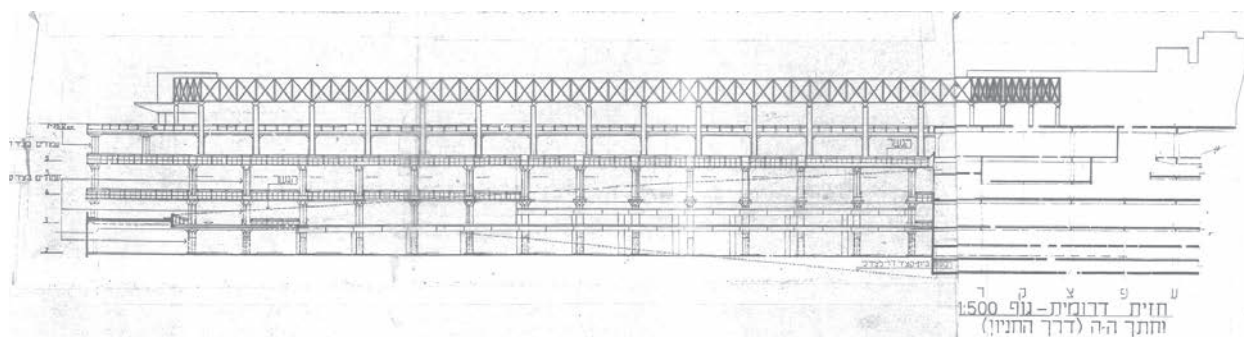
SOUTH HAKONGRES ST ELEVATION
